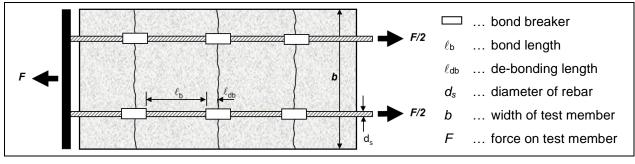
Example for test member with bond breaking pipes on rebar (plan view)
